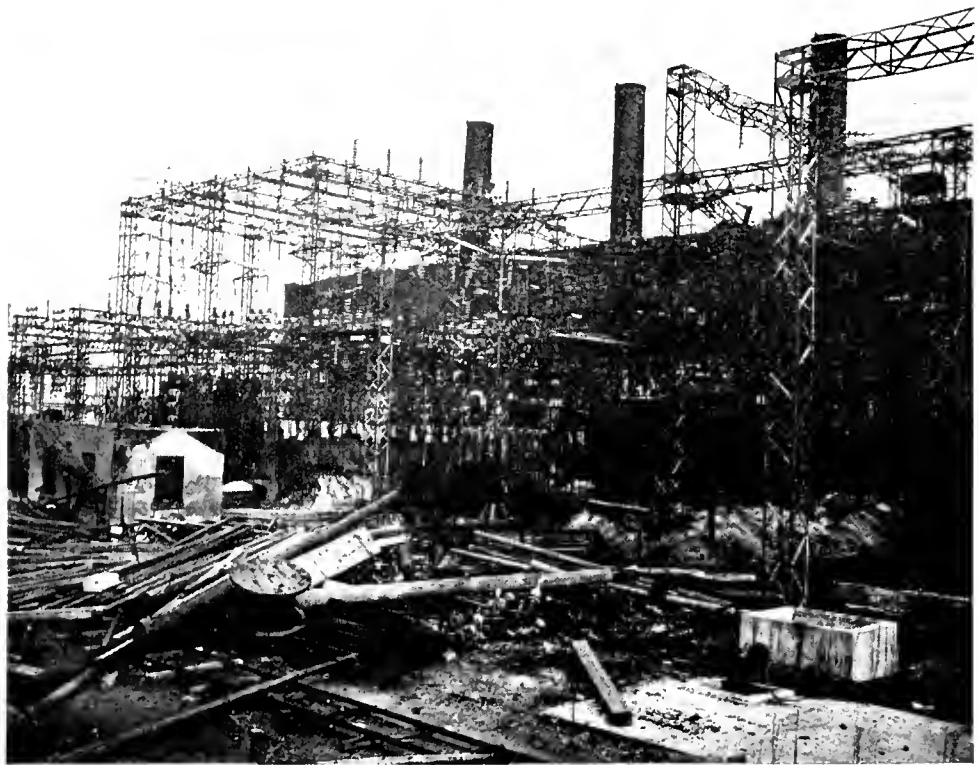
General view of part of switch and transformer yard showing some of damaged section
